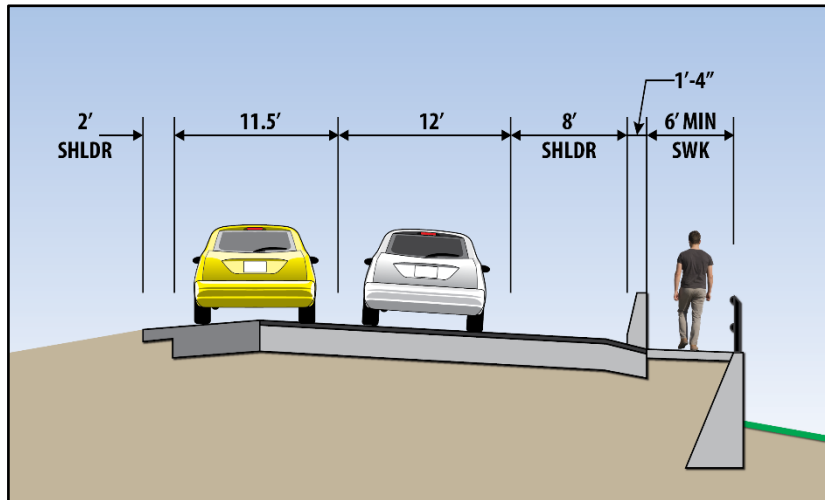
Shave Bridge Approaches Pedestrian Improvements
